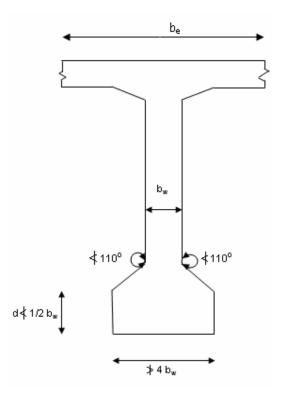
Dimensions criteria for 'I' girders as per Fig 10 of IRC:21-2000
